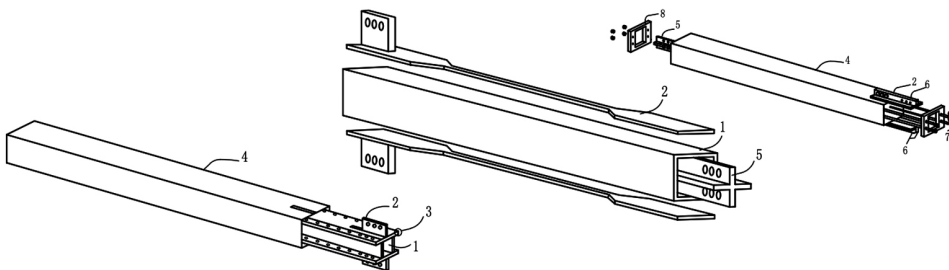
The SC-BRB web-member-design plan; 1 – steel inner casing, 2 – inner core, 3 – intermediate-constraint force-transmission element, 4 – steel outer casing, 5 – internal adapting piece, 6 – outer adapting piece, 7 – prestressed tendons, 8 – end plates
